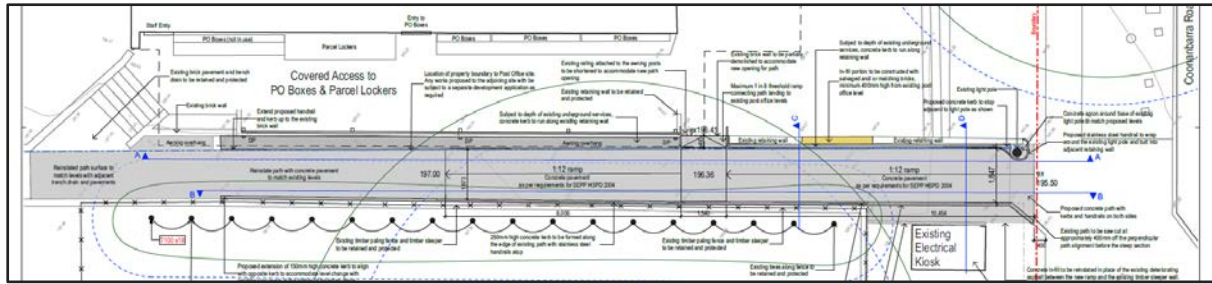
| Archdale Walk upgrade plans (Applicants EIS)
